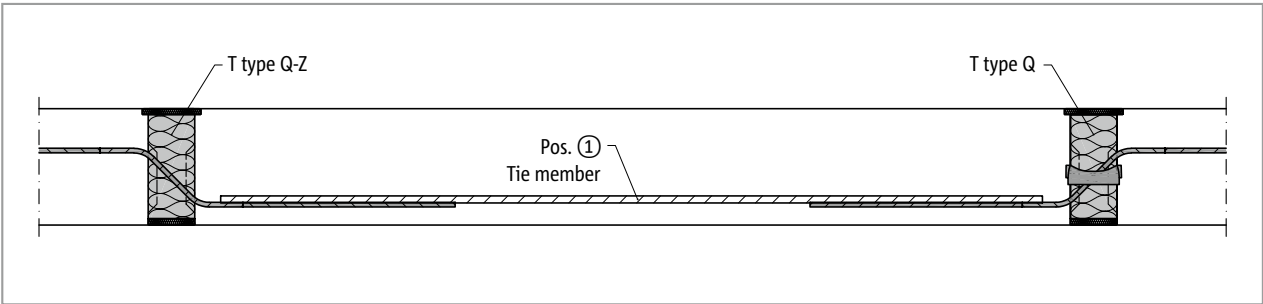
Schöck Isokorb® T type Q-Z-V6 to Q-Z-V12, Q-V6 to Q-V12: Section A-A; One-way reinforced concrete slab
